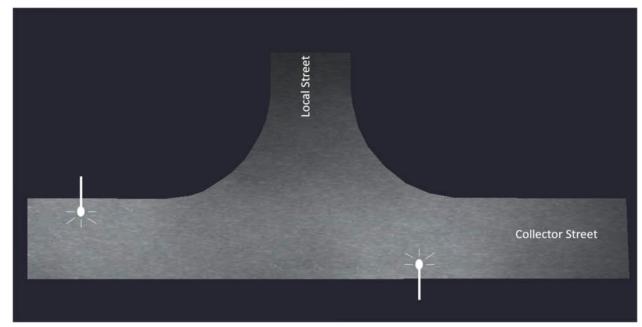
Rendering of T-Intersection: Local Street vs Collector Street – Top View
